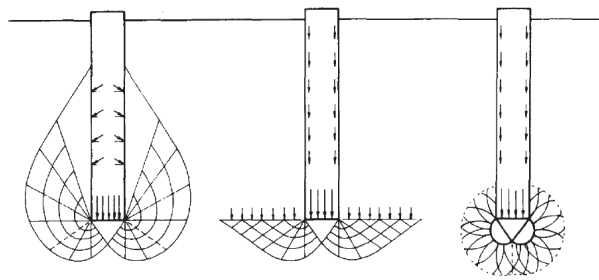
Examples of assumed failure mechanism under deep foundations (after Vesić, 1967).
